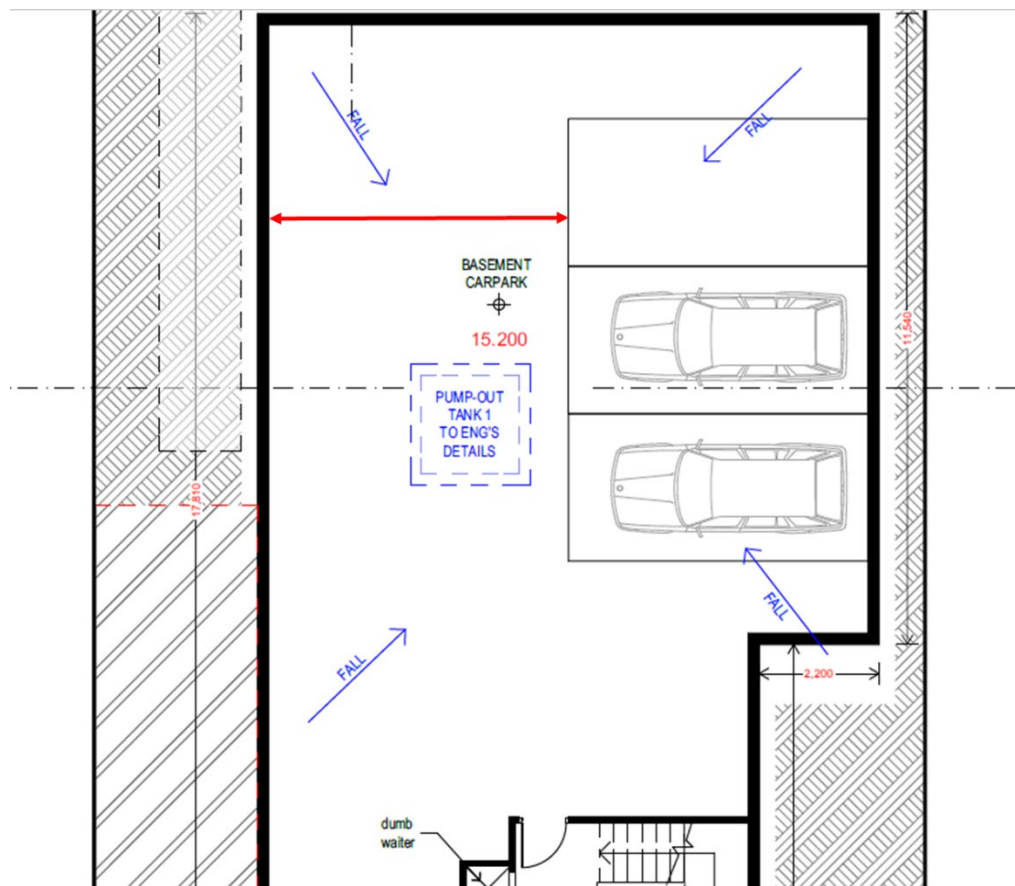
Extract of the marked-up first proposed basement plan provided by council's Traffic Manager.
